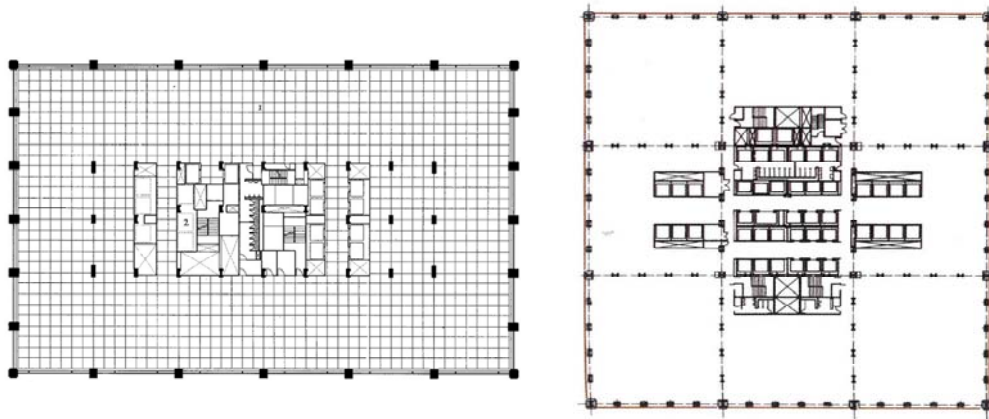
(a) Ground floor plan of John Hancock Center, Chicago; (b) Ground floor plan of the Willis Tower, Chicago (Binder & CTBUH, 2006, p. 32)
